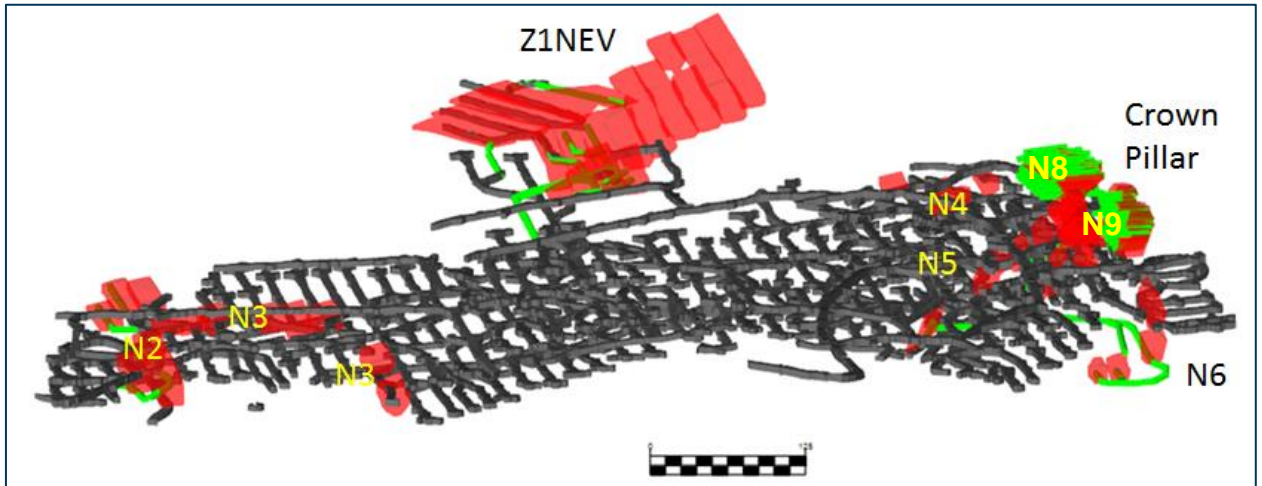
ISOMETRIC VIEW OF NEVINSTOWN. PLANNED DEVELOPMENT (TUNNELLING) IN GREEN, PLANNED STOPING IN RED. EXISTING DEVELOPMENT IN GREY.
